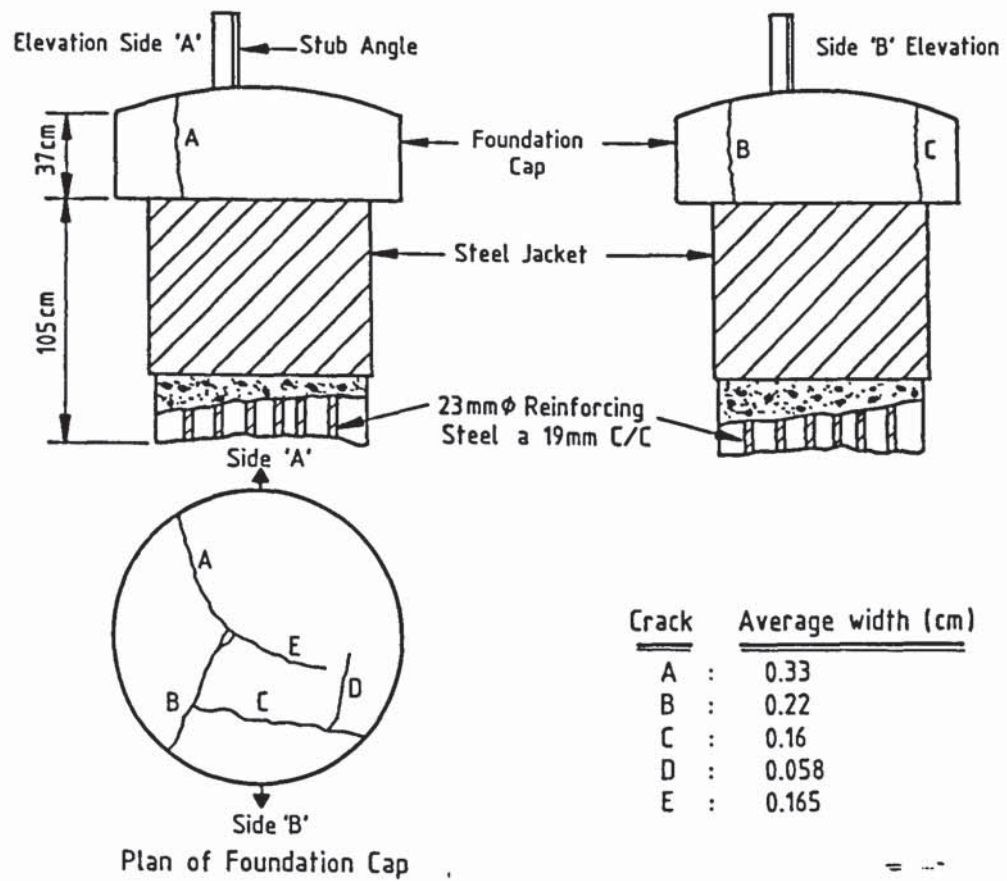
Details of the pier foundations inspected (Case Study 1)
